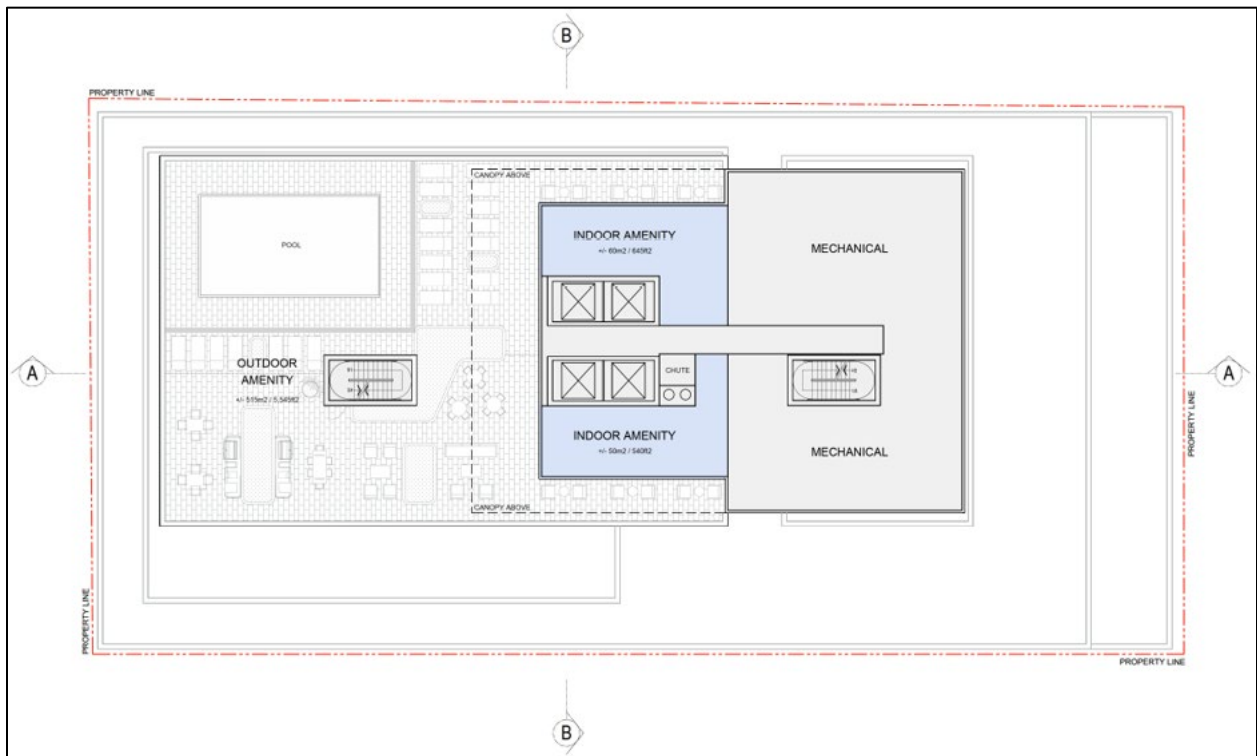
M.P.H Floor Plan (Source: Hariri Pontarini Architects)
